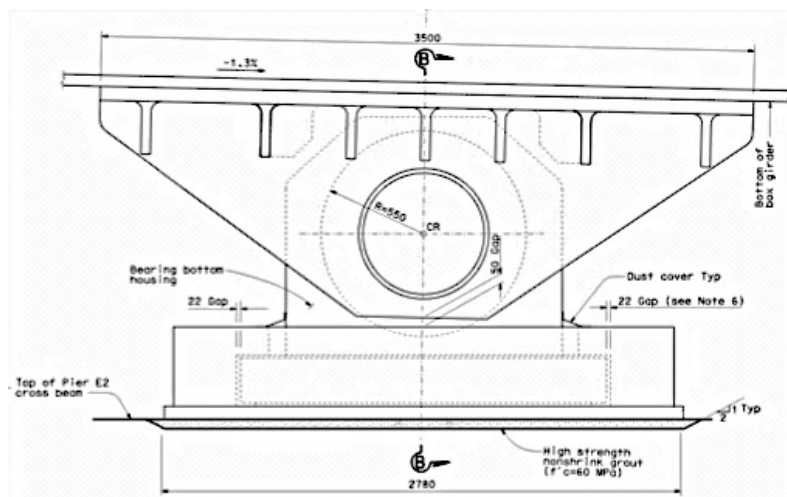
Lateral view of bearing at Pier E2 [Ref.: Caltrans drawings 883/1204].
